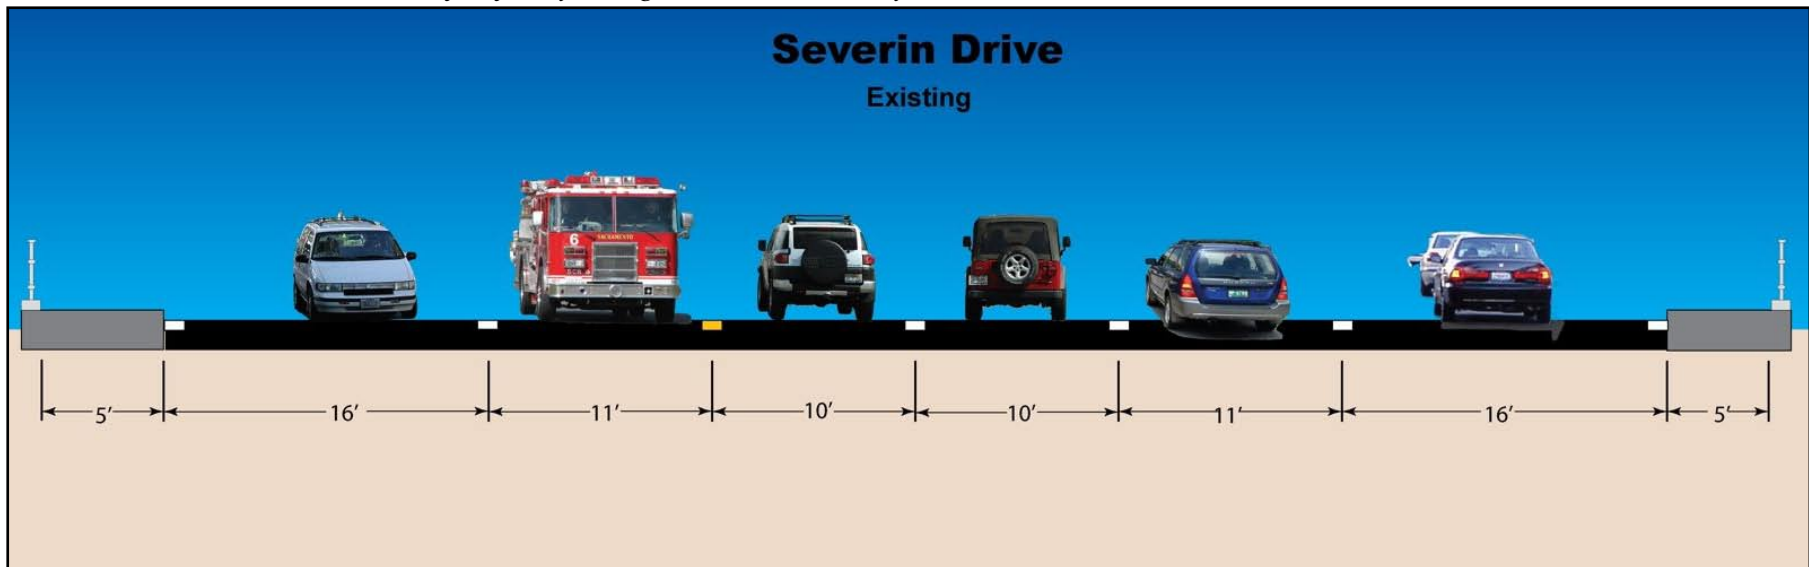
Existing lane configuration of the Severin Drive freeway crossing bridge, looking south from bridge center.
